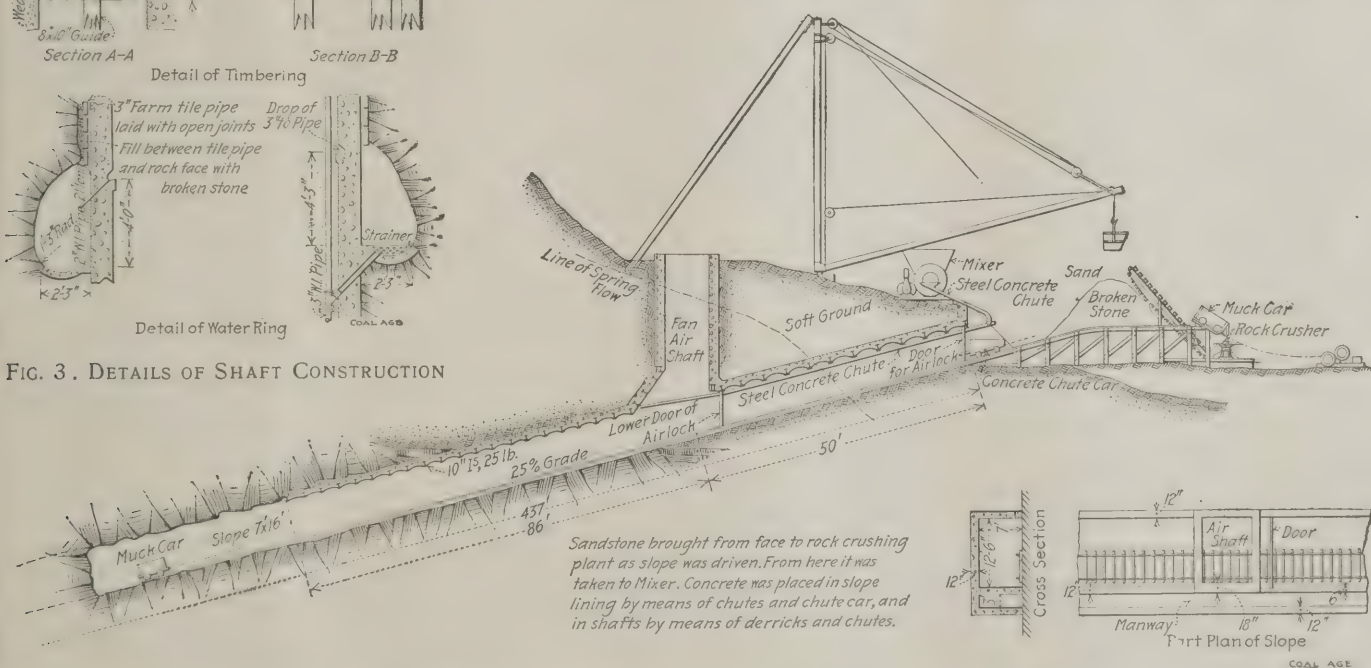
DETAILS OF SLOPE CONSTRUCTION AND CONTRACTOR'S PLANT
